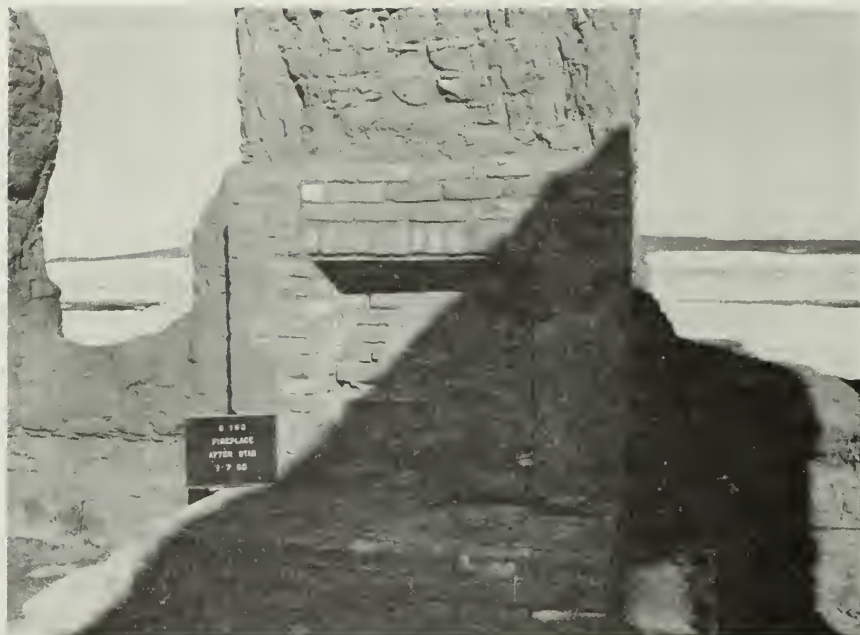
Building 6-160, Room 163, fireplace in east wall, after stabilization. Soil-cement mortar used to reset bricks was brushed to prevent shine. Fort Union National Monument.
